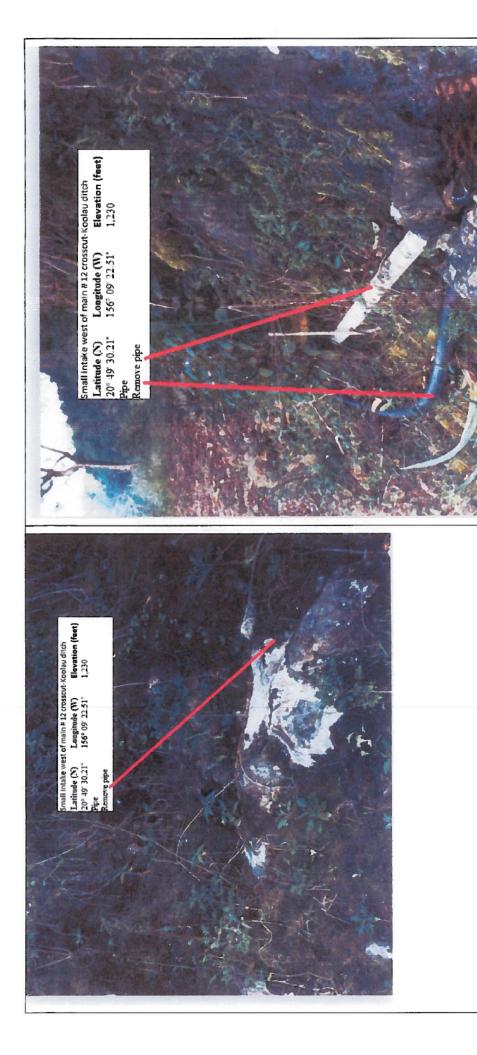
Small intake west of number 12 crosscut intake at Koolau Ditch #2 of 6 (K-24g)
